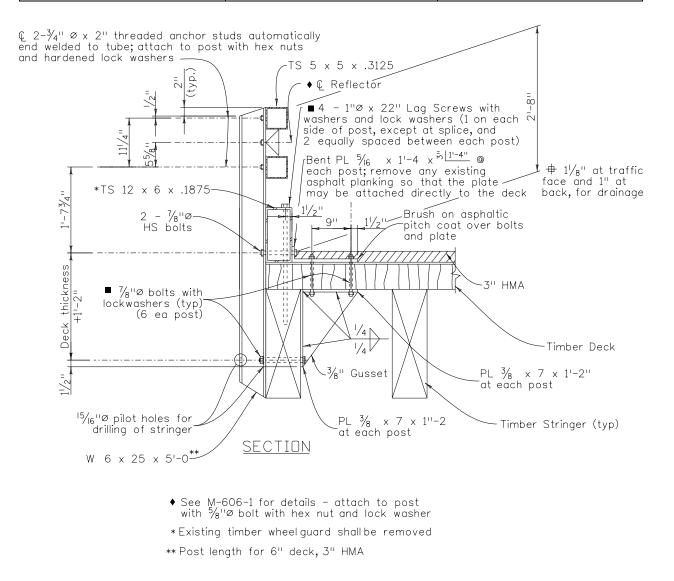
(A)-5 Sample Section showing Timber Bridge Rail Replacement (To be used if replacement is not an option)
